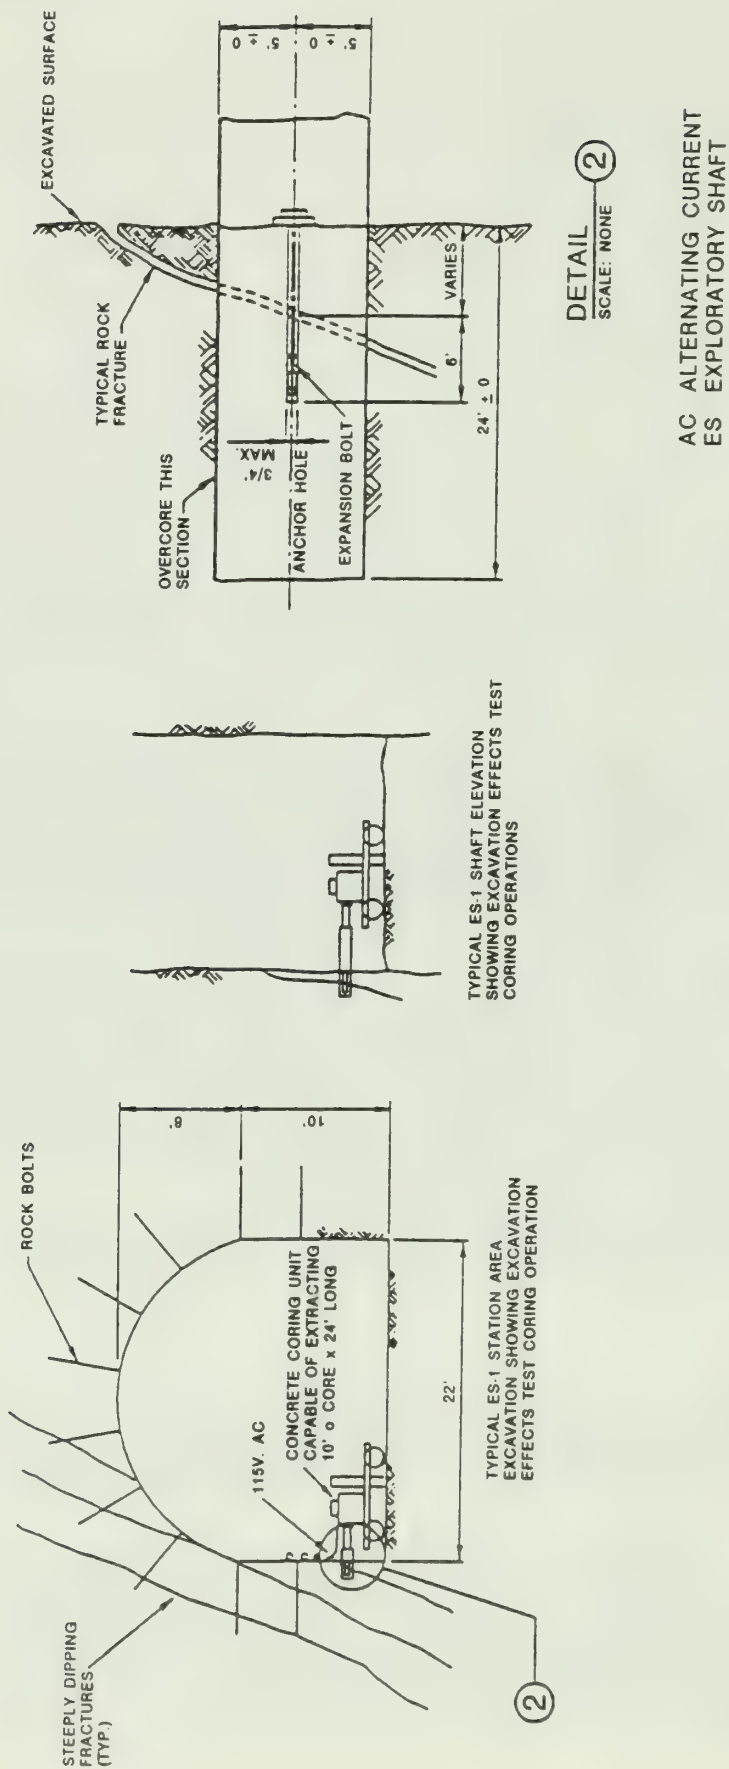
Intact fracture test arrangement - typical. Modified from Title I design package (DOE, 1988).
